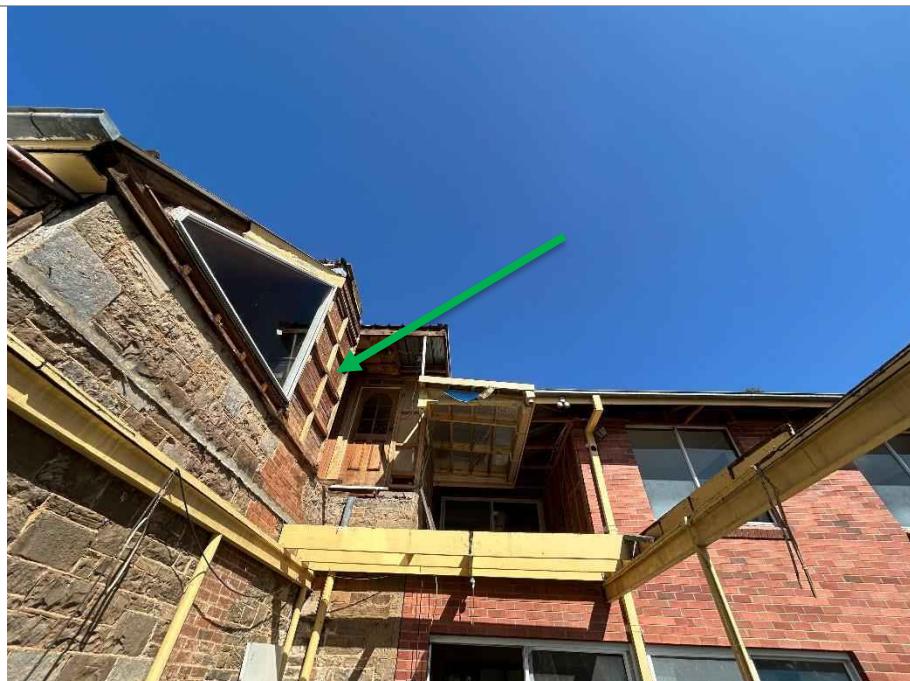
Photograph following removal of first floor bathroom wall sheet
